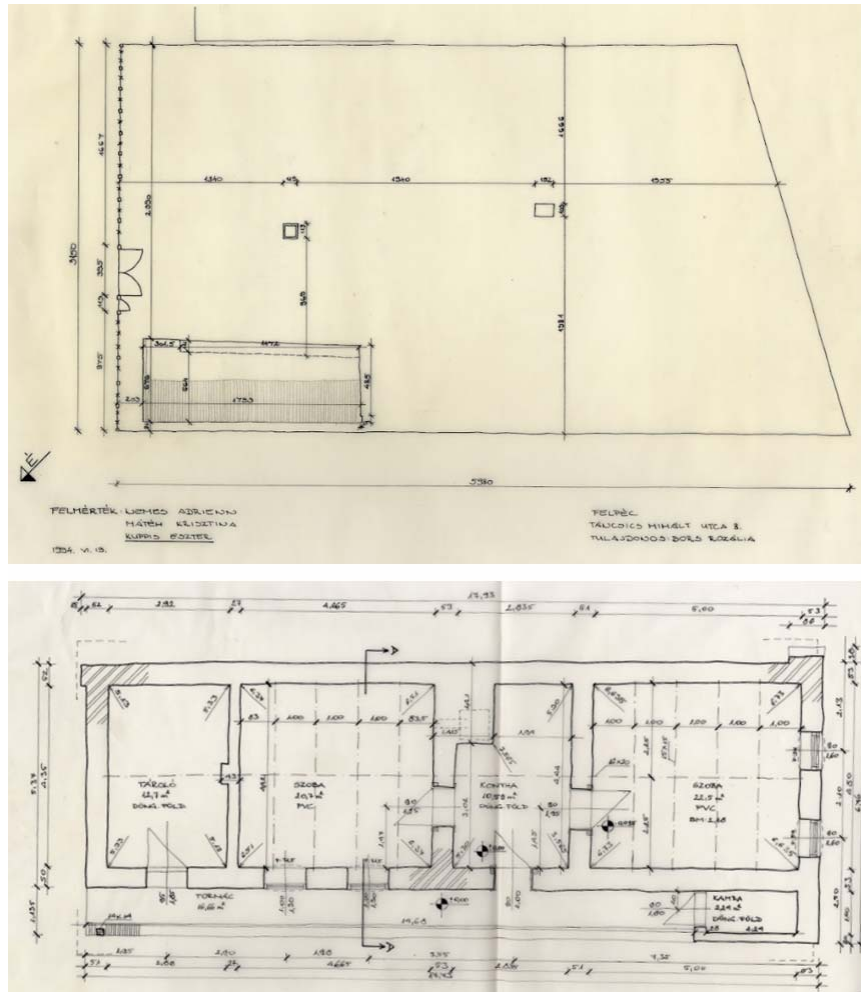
Site plan and ground plan. An earth wall (“swallow’s nest”), a brick wall and stone set in mud alternate in the structure. We also find a walled-in door in the atrium. The site plan only shows the fencing of the front garden.
